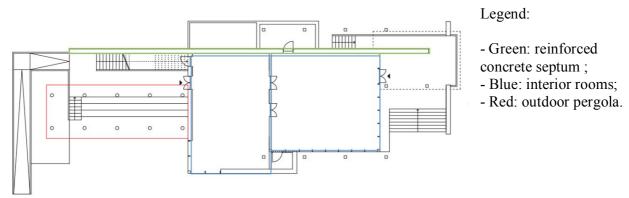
Ground Floor: educational and external areas and reinforced concrete septum
